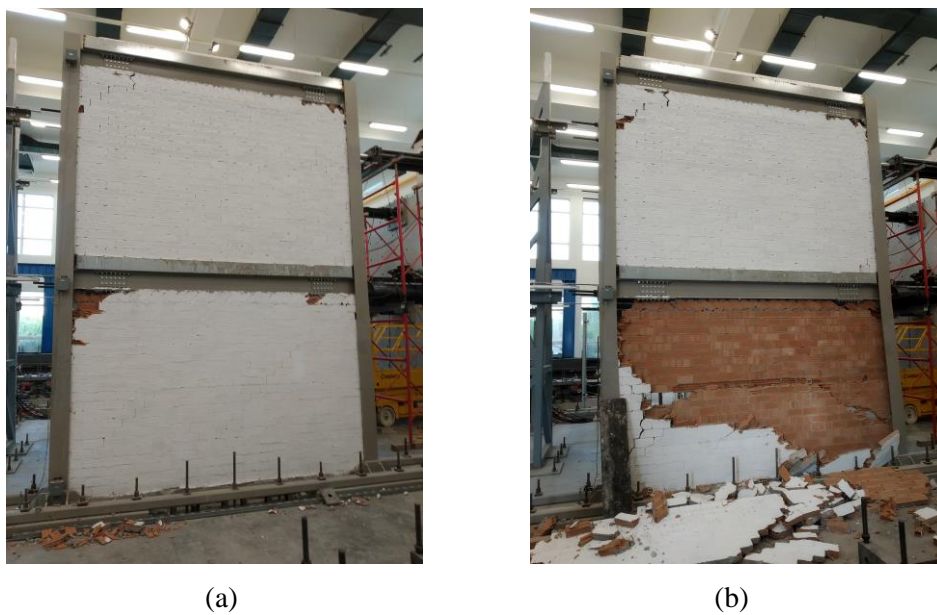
Damage on the masonry infills: (a) SF = 1.0 and (b) SF = 3.0.
